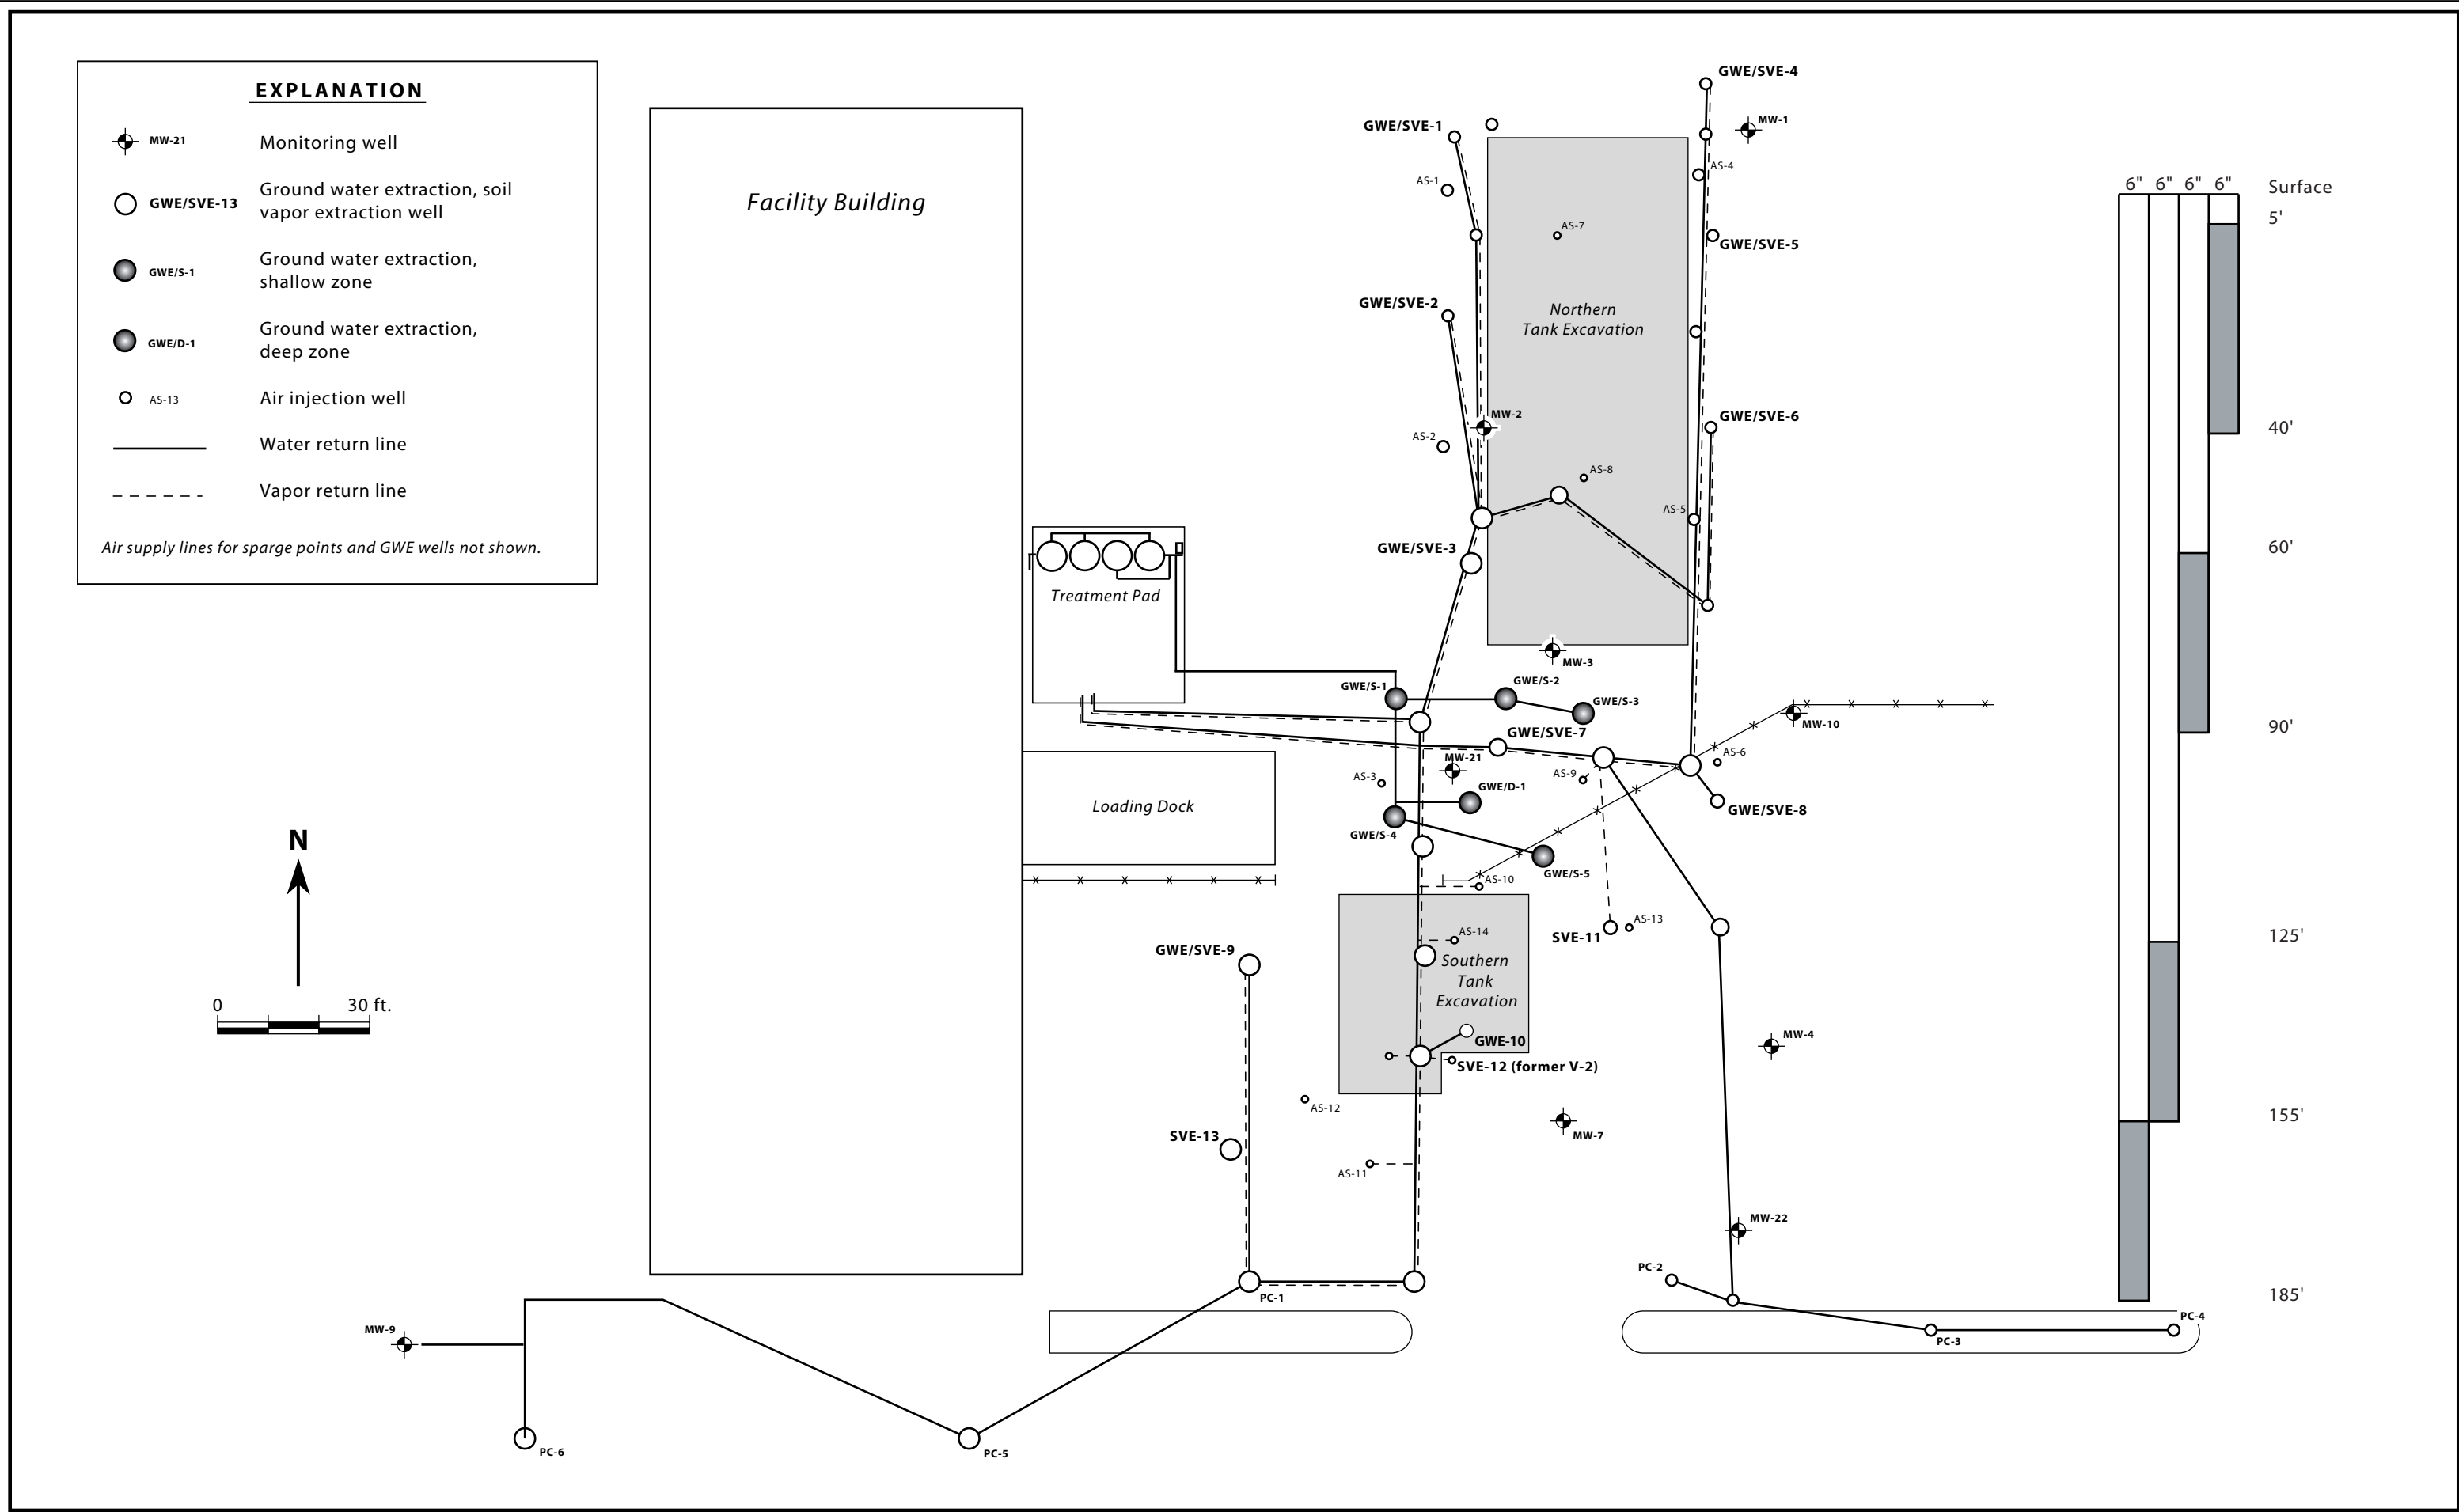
Deep Zone GWE Schematic, Remediation System - Plan View - 455 Yolanda Avenue, Santa Rosa, California
